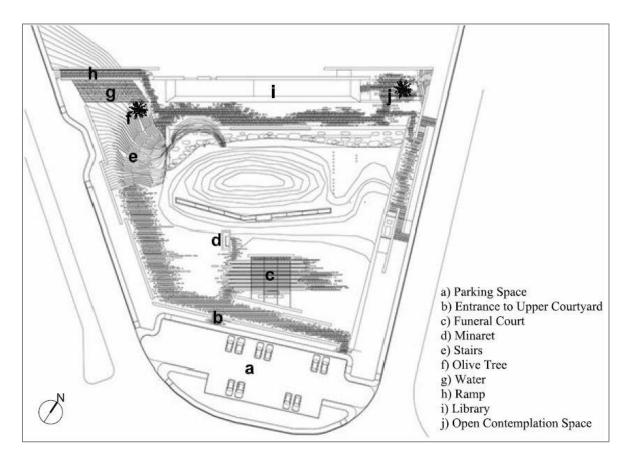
Sancaklar Mosque layout plan (Adapted from the Architectural Review, 2014.)
